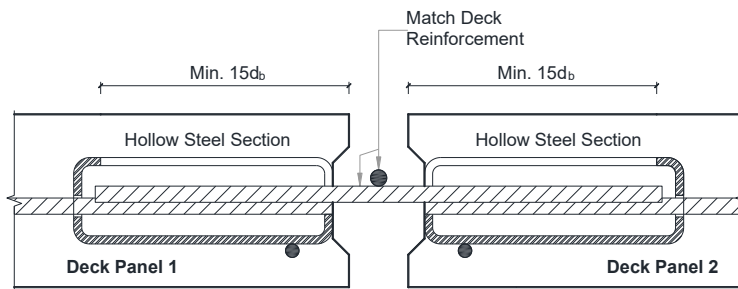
Groove-to-Groove Transverse Joint Detailing for Fully Precast Bridge
